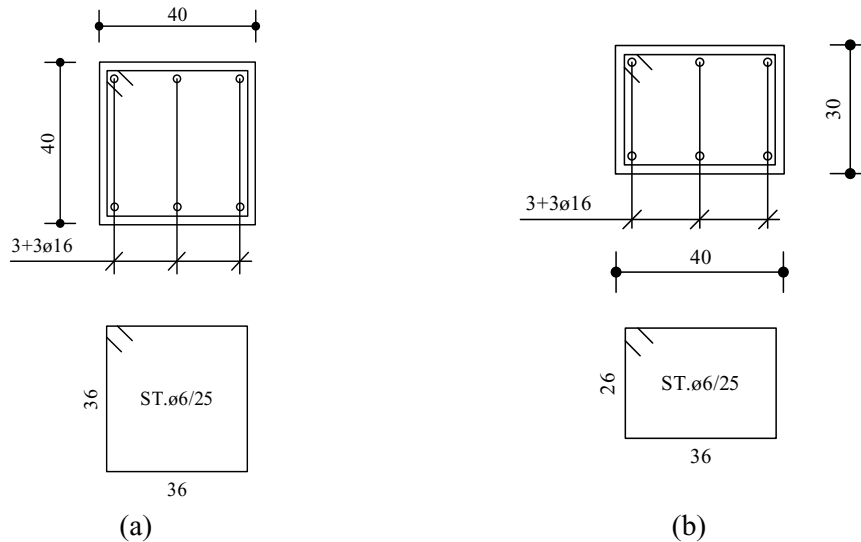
Reinforcement details of columns No. 37 to 40 at: (a) 1st and 2nd floors; (b) 3rd and 4th floors
